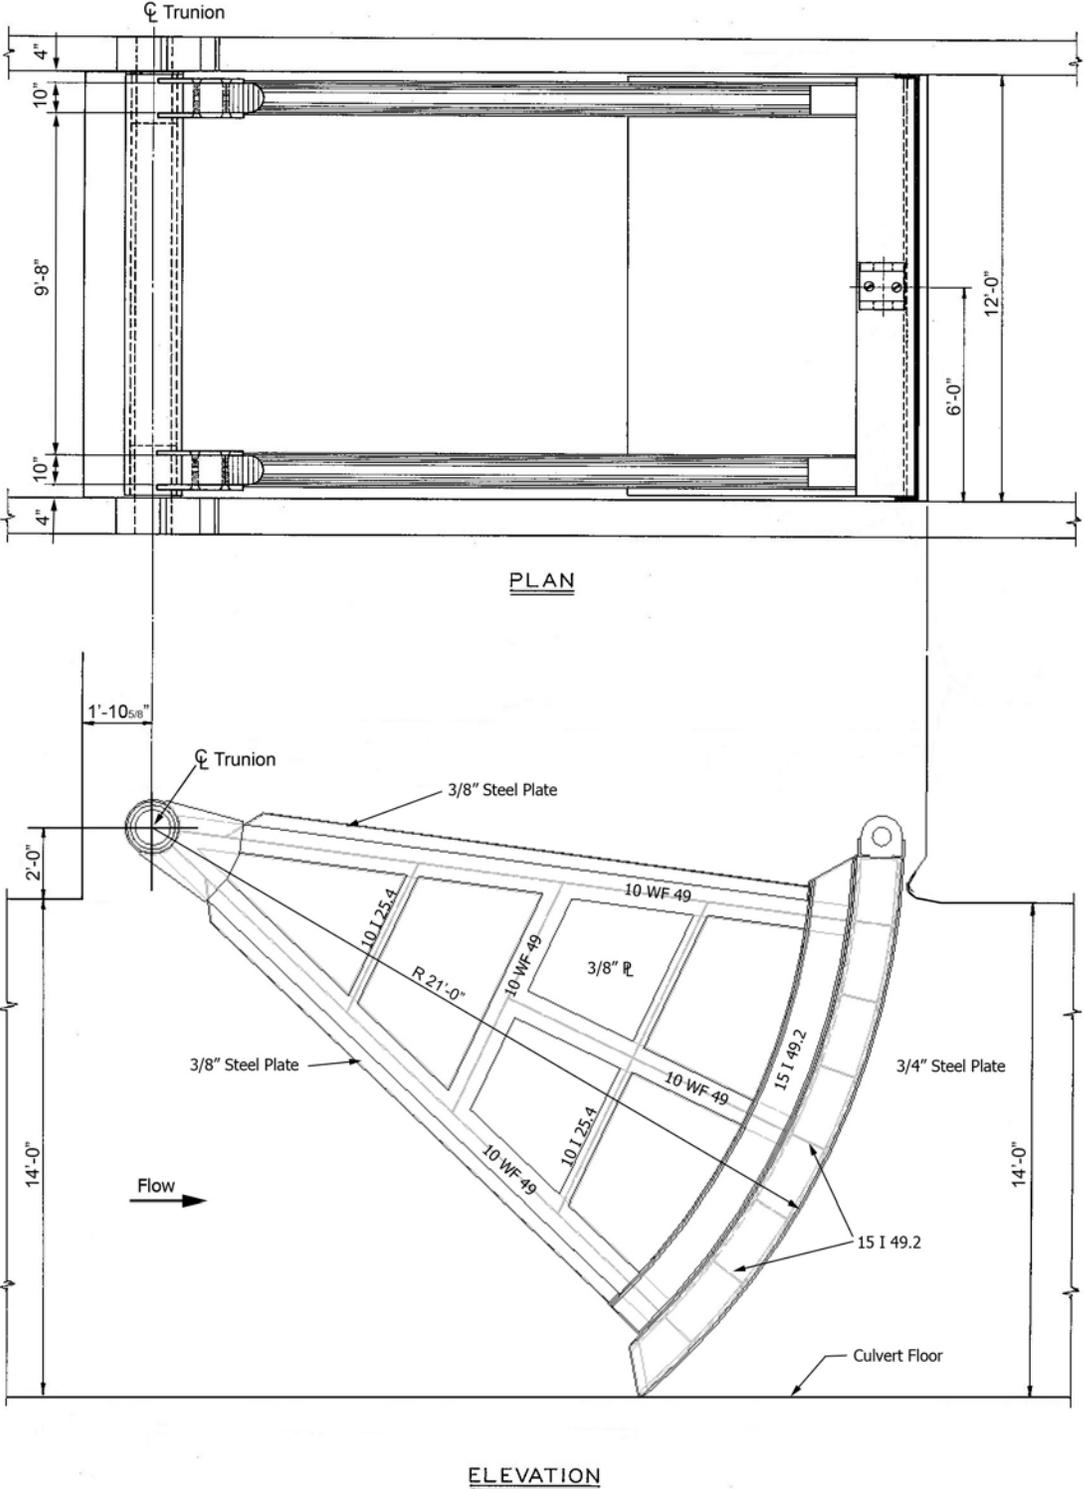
Tainter Valve, Snell Lock, Type 5 Design.
